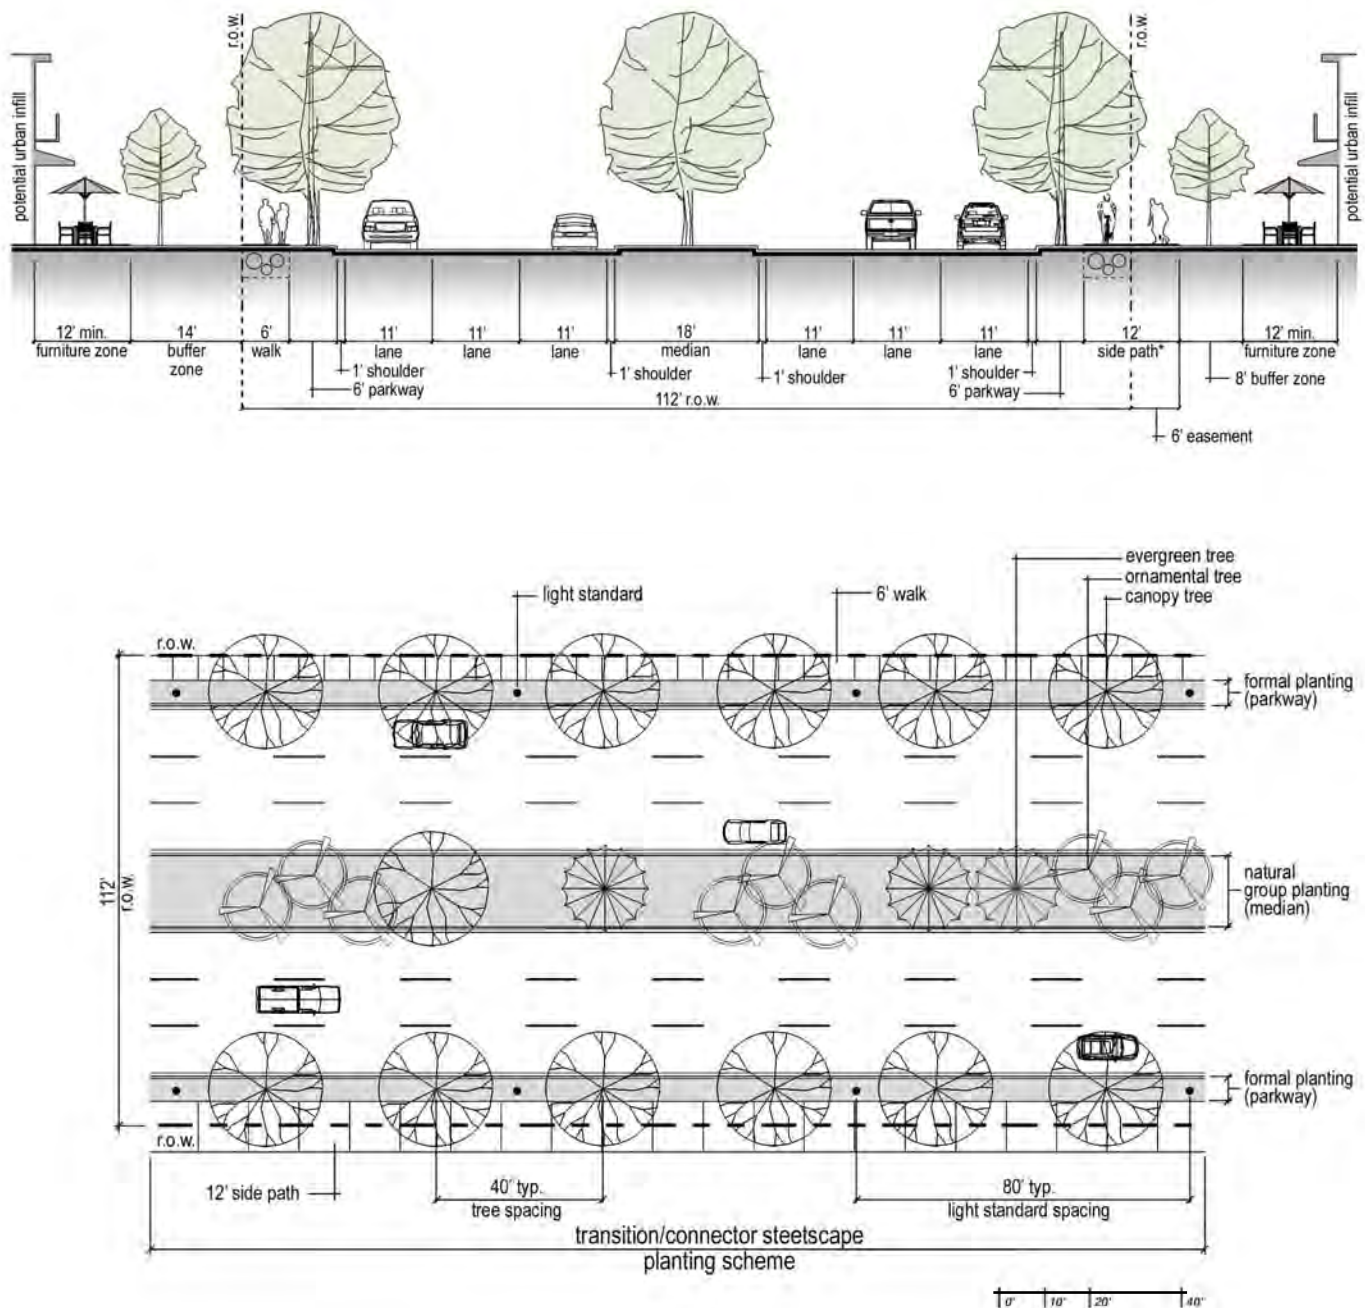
Typical Transition Arterial Section & Plan: Principal Arterial
